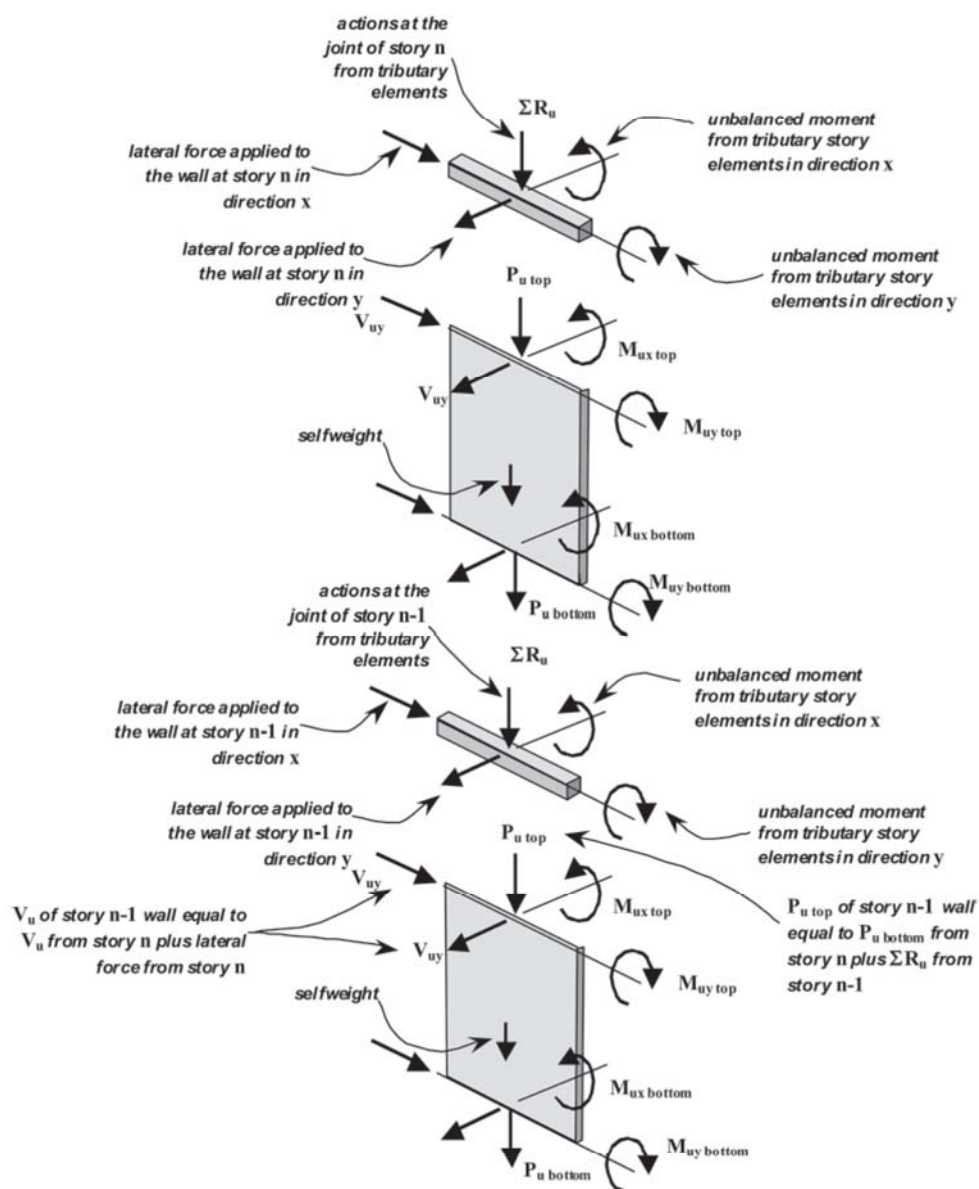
Reinforced concrete wall with applied factored loads and moments.
